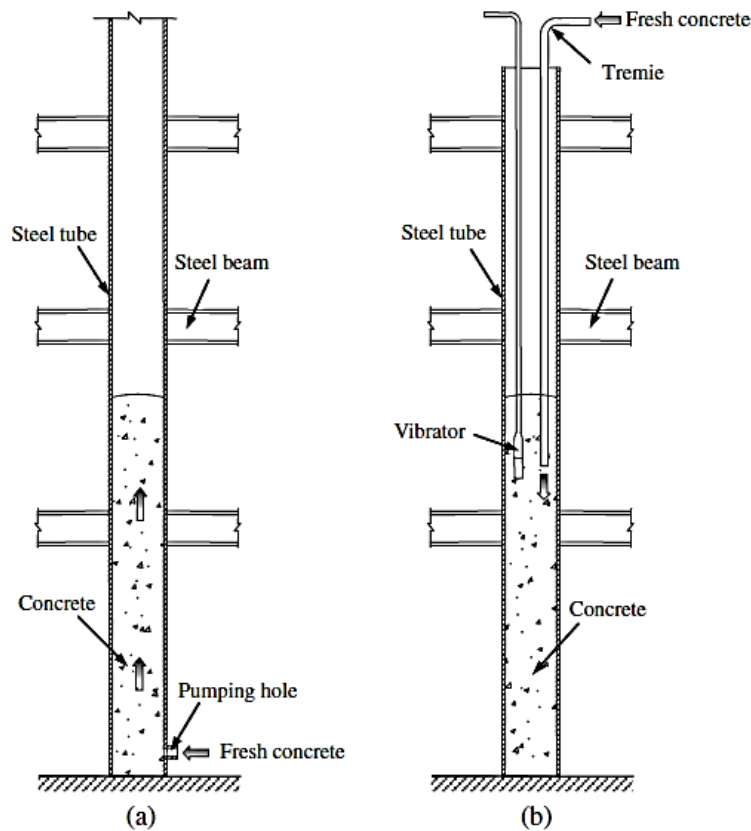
Schematic view of concrete placement into steel tubular column (Han et al., 2014)
